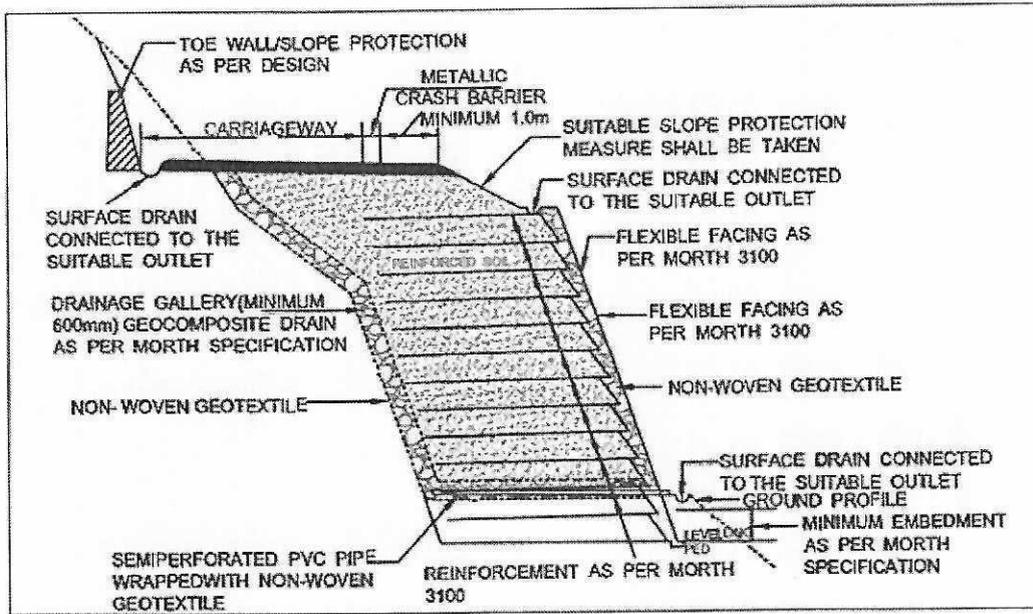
Cross-section of Reinforced Soil Slope with Flexible Facing
